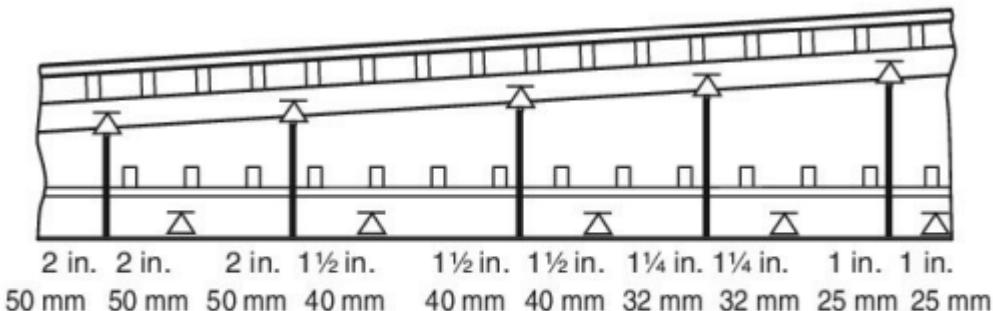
(a) Arrangement of Branch Lines Supplying Sprinklers Above and Below Ceiling.
